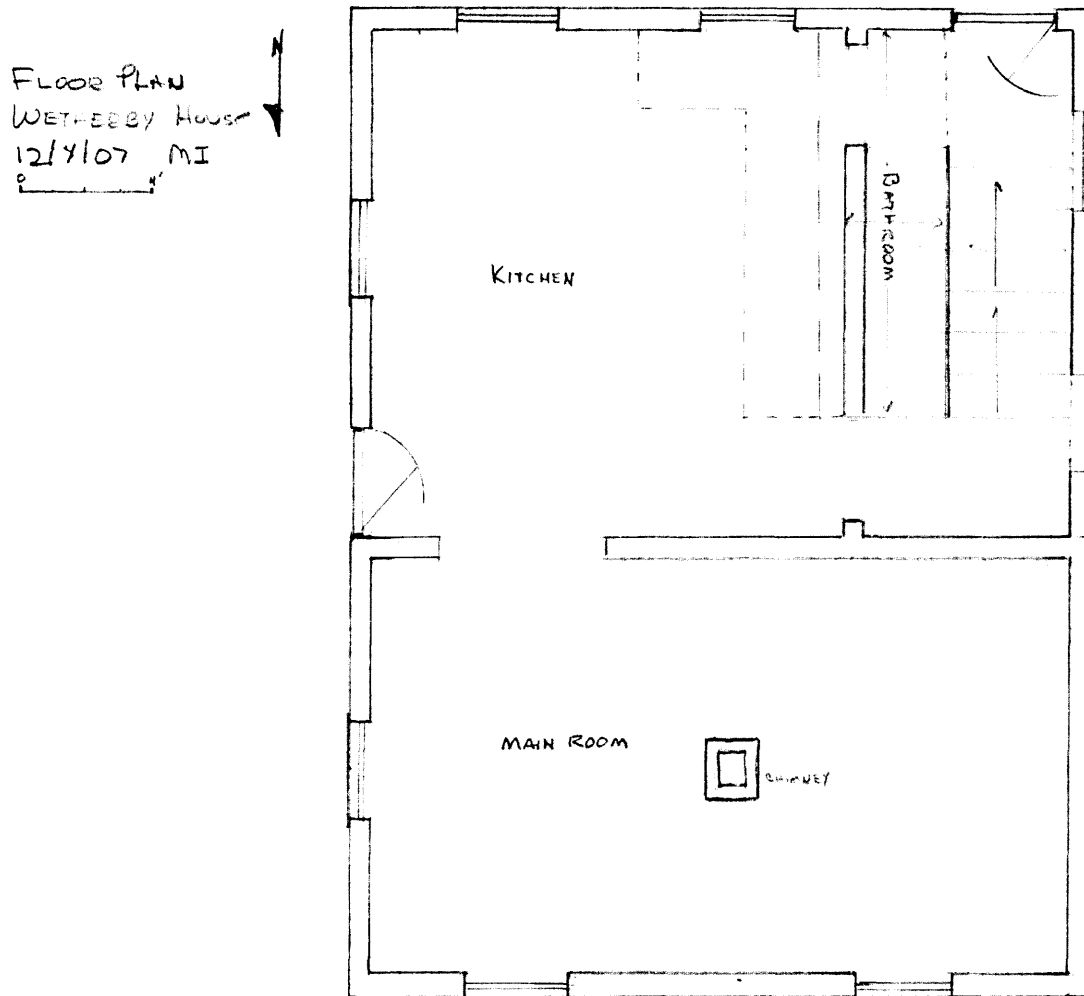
Floor plan of first floor at original site as drawn by by Marlin Ingalls, November 2007. Drawing used a scale of 2.5 squares to represent 1 foot.
